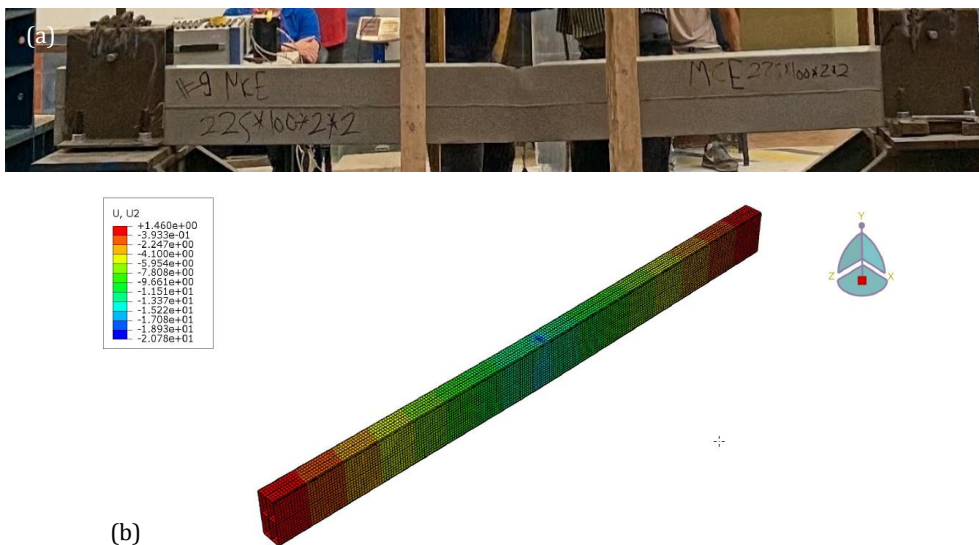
Deformed shape of 100X225X2X2 empty multi-cell column (MCC-E):
